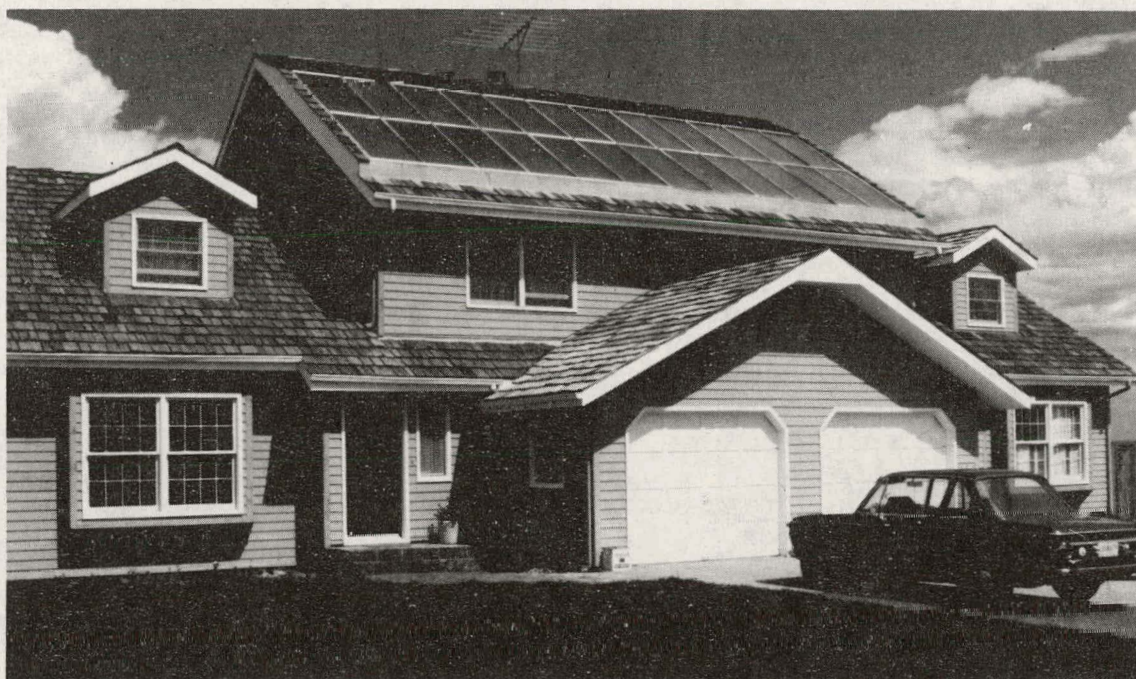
Splittgerber Solar House with Solaron Air-Type Collectors Mounted on a South-Facing, 48-degree Sloping Roof
